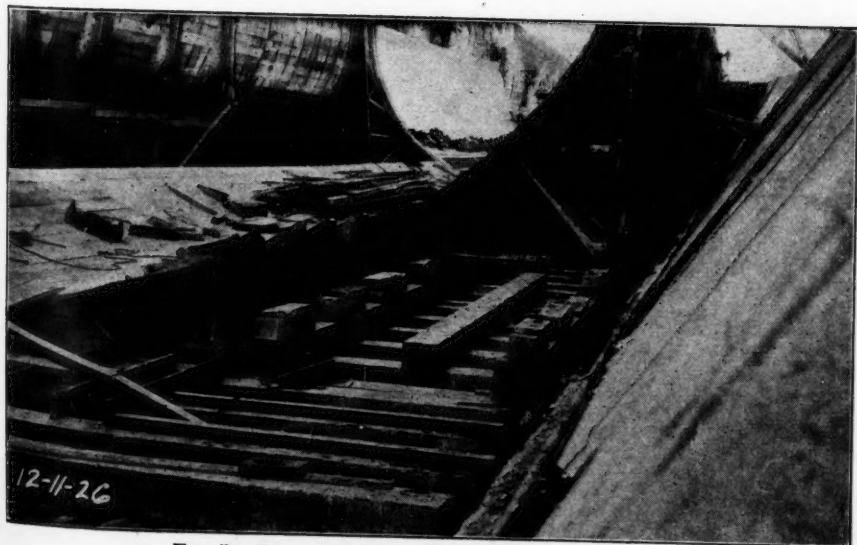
VIEW OF LOWER CRADLE AND OUTSIDE FORM.
